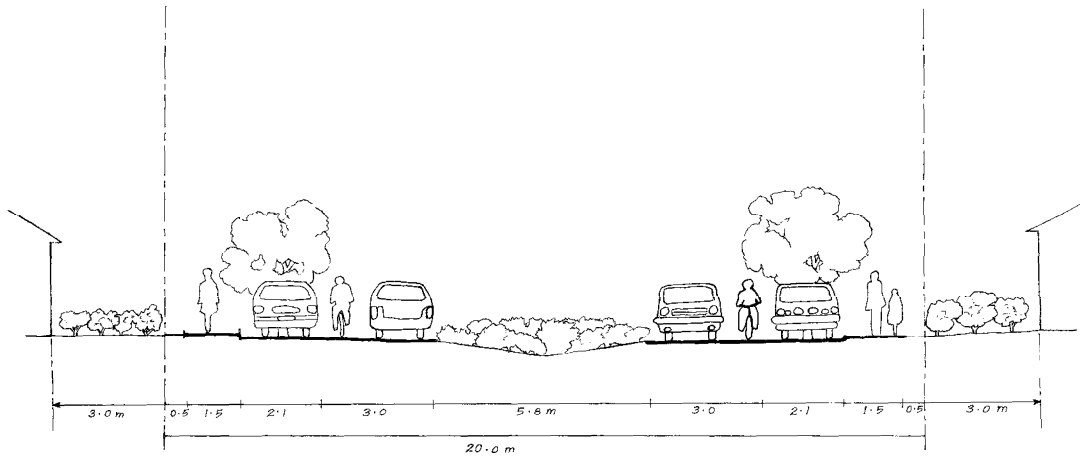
TYPICAL ROAD CROSS-SECTION
